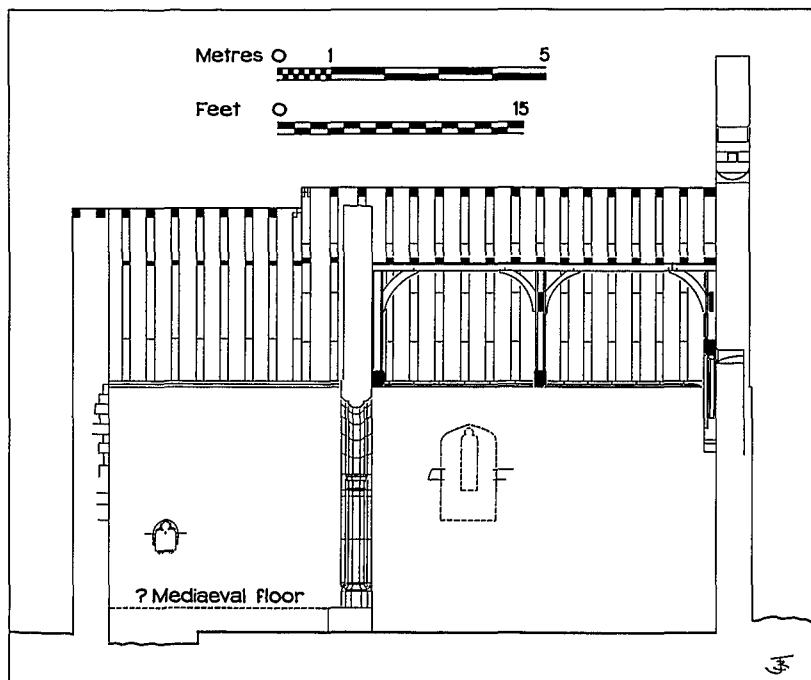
Horton Manor Chapel: Longitudinal Section, looking South (window details hypothetical).
